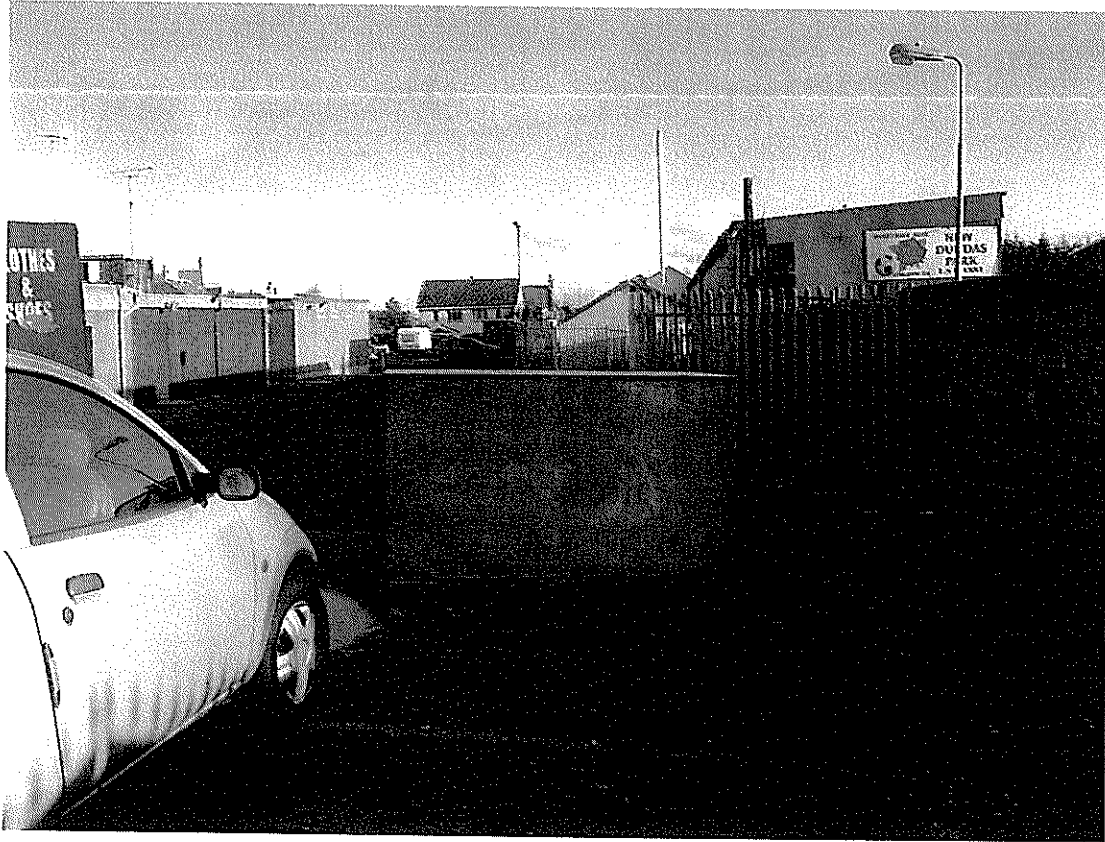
(taken on 10/11/10) shows other floodlight (on right) and remains of old concrete car park (on left)
